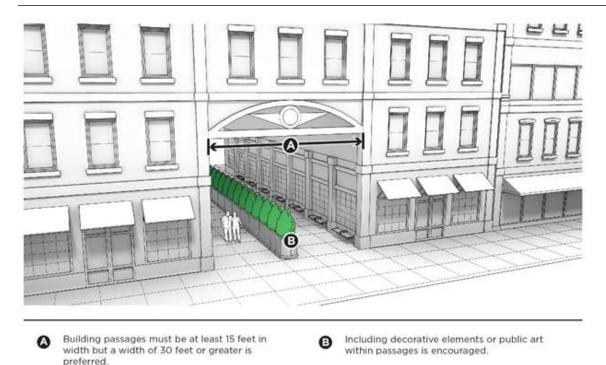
GENERAL REQUIREMENTS FOR BUILDING PASSAGES
